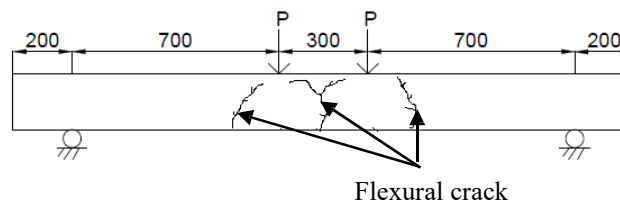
Crack pattern of beam B1 (unit in mm).
